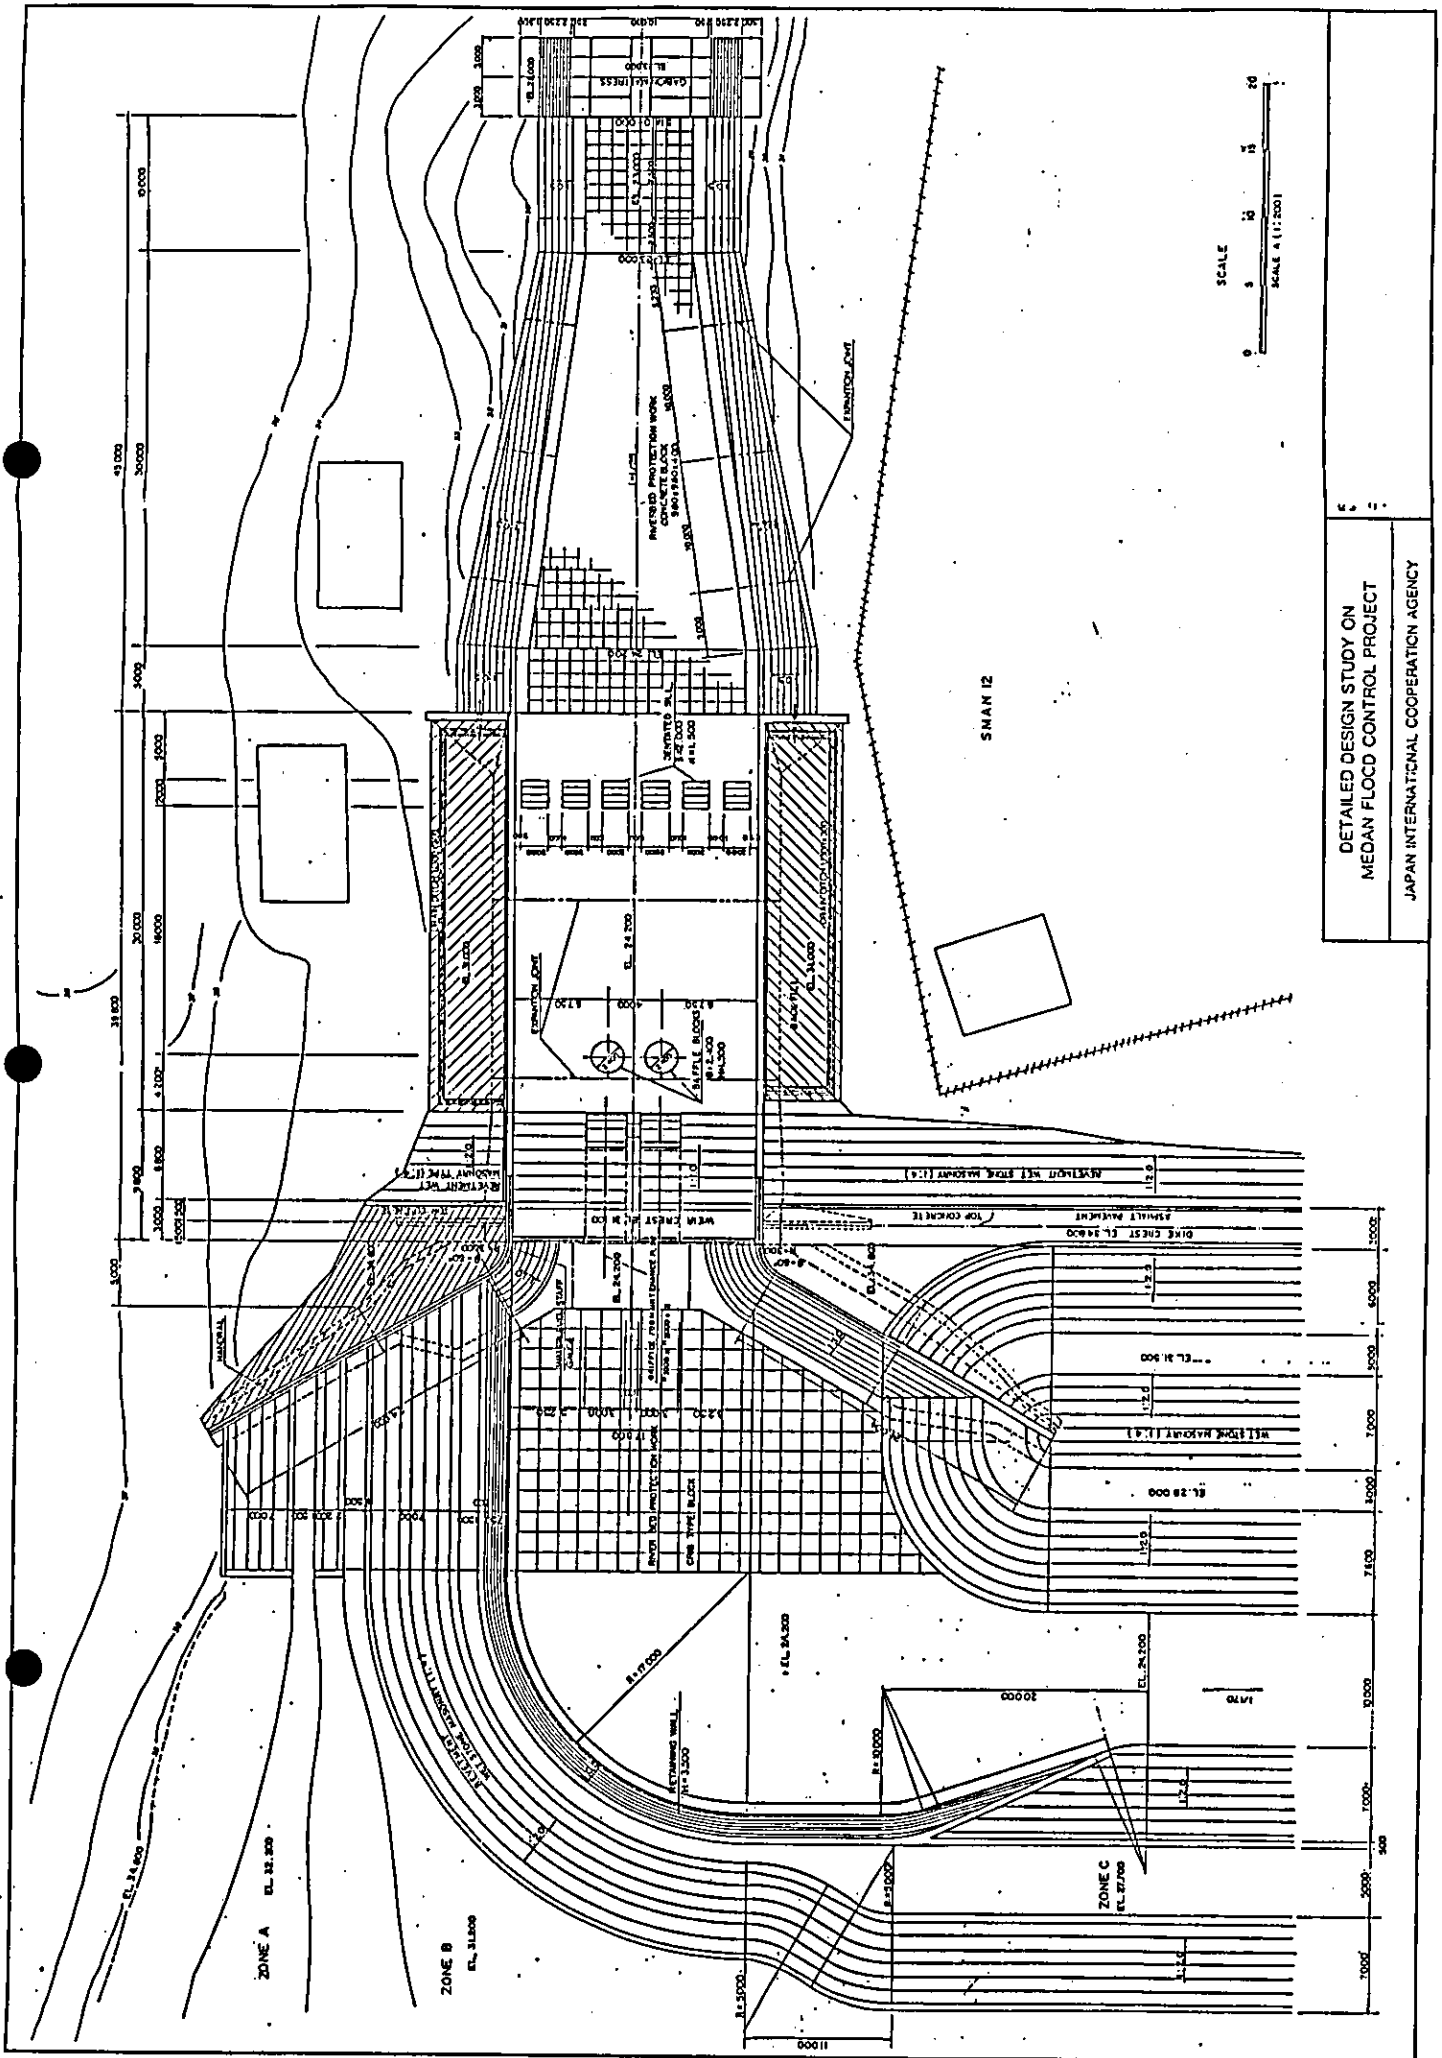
(1/2) DELI RIVER WEIR, PLAN
